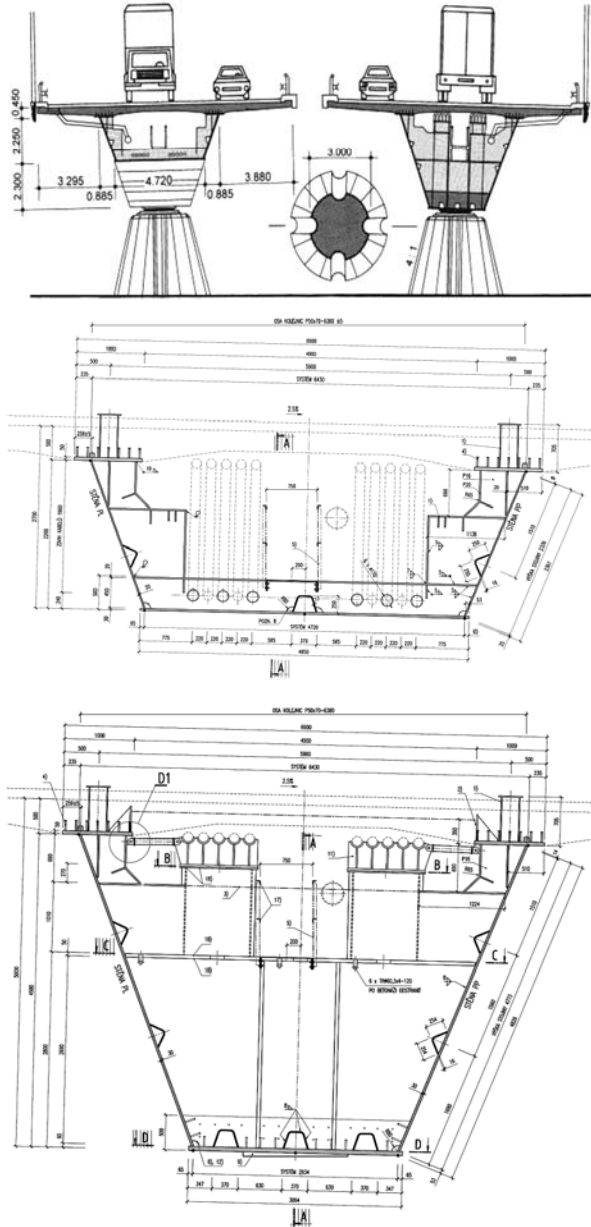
The bridge cross-sections at midspan and over the support [4, 5]
